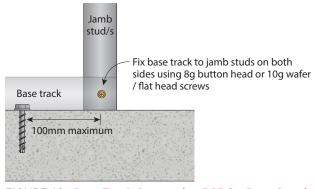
Base Track Connection BC3 for Door Opening Elevation
